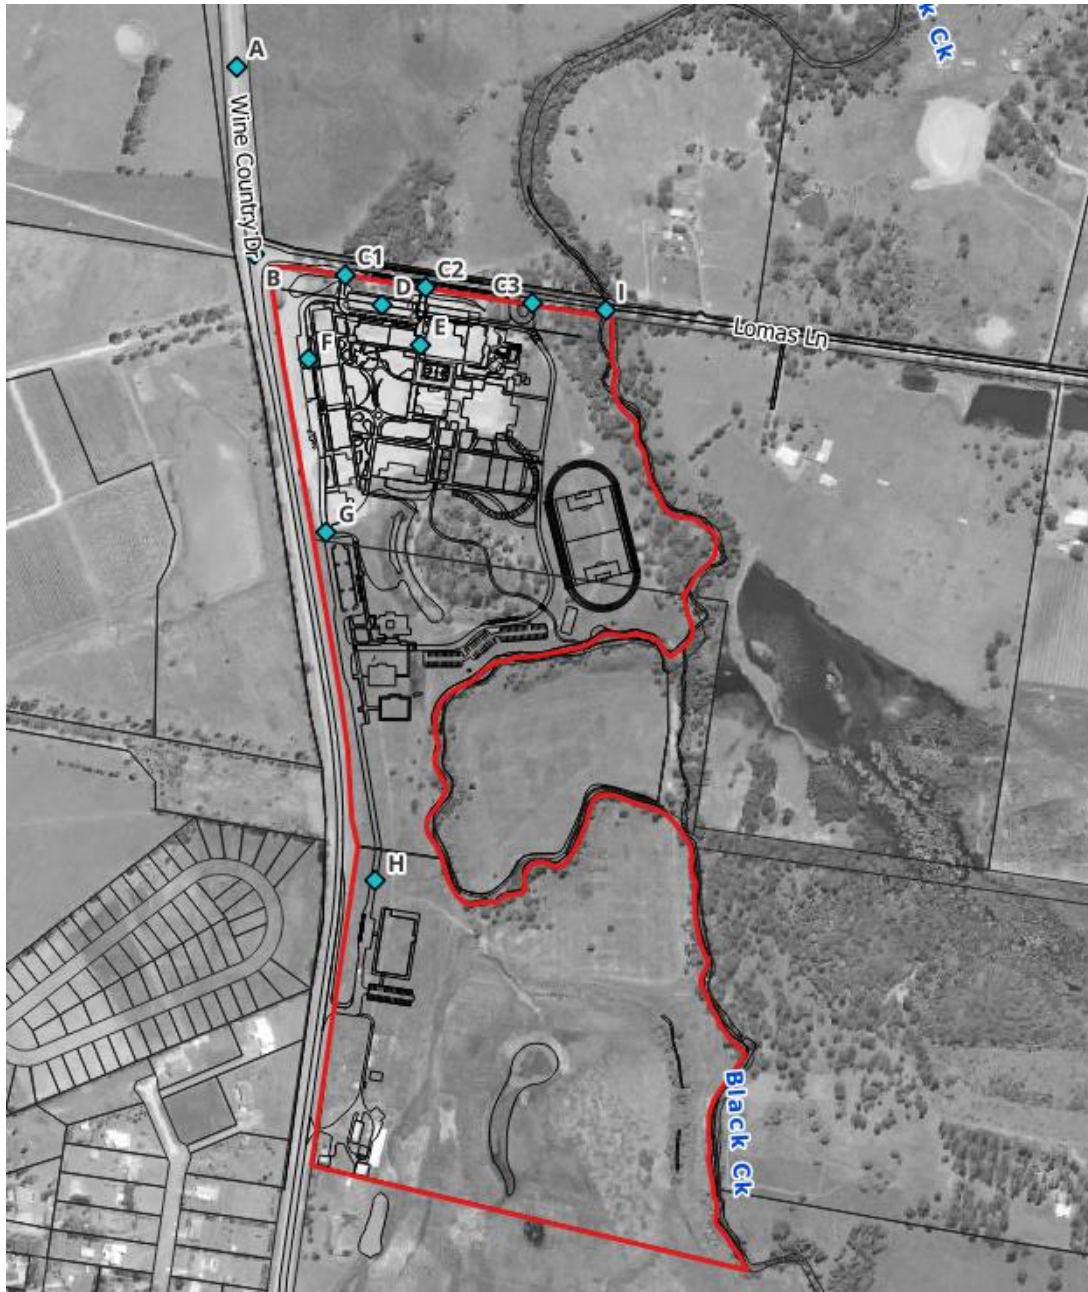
Masterplan Layout Overall with Reporting Locations
